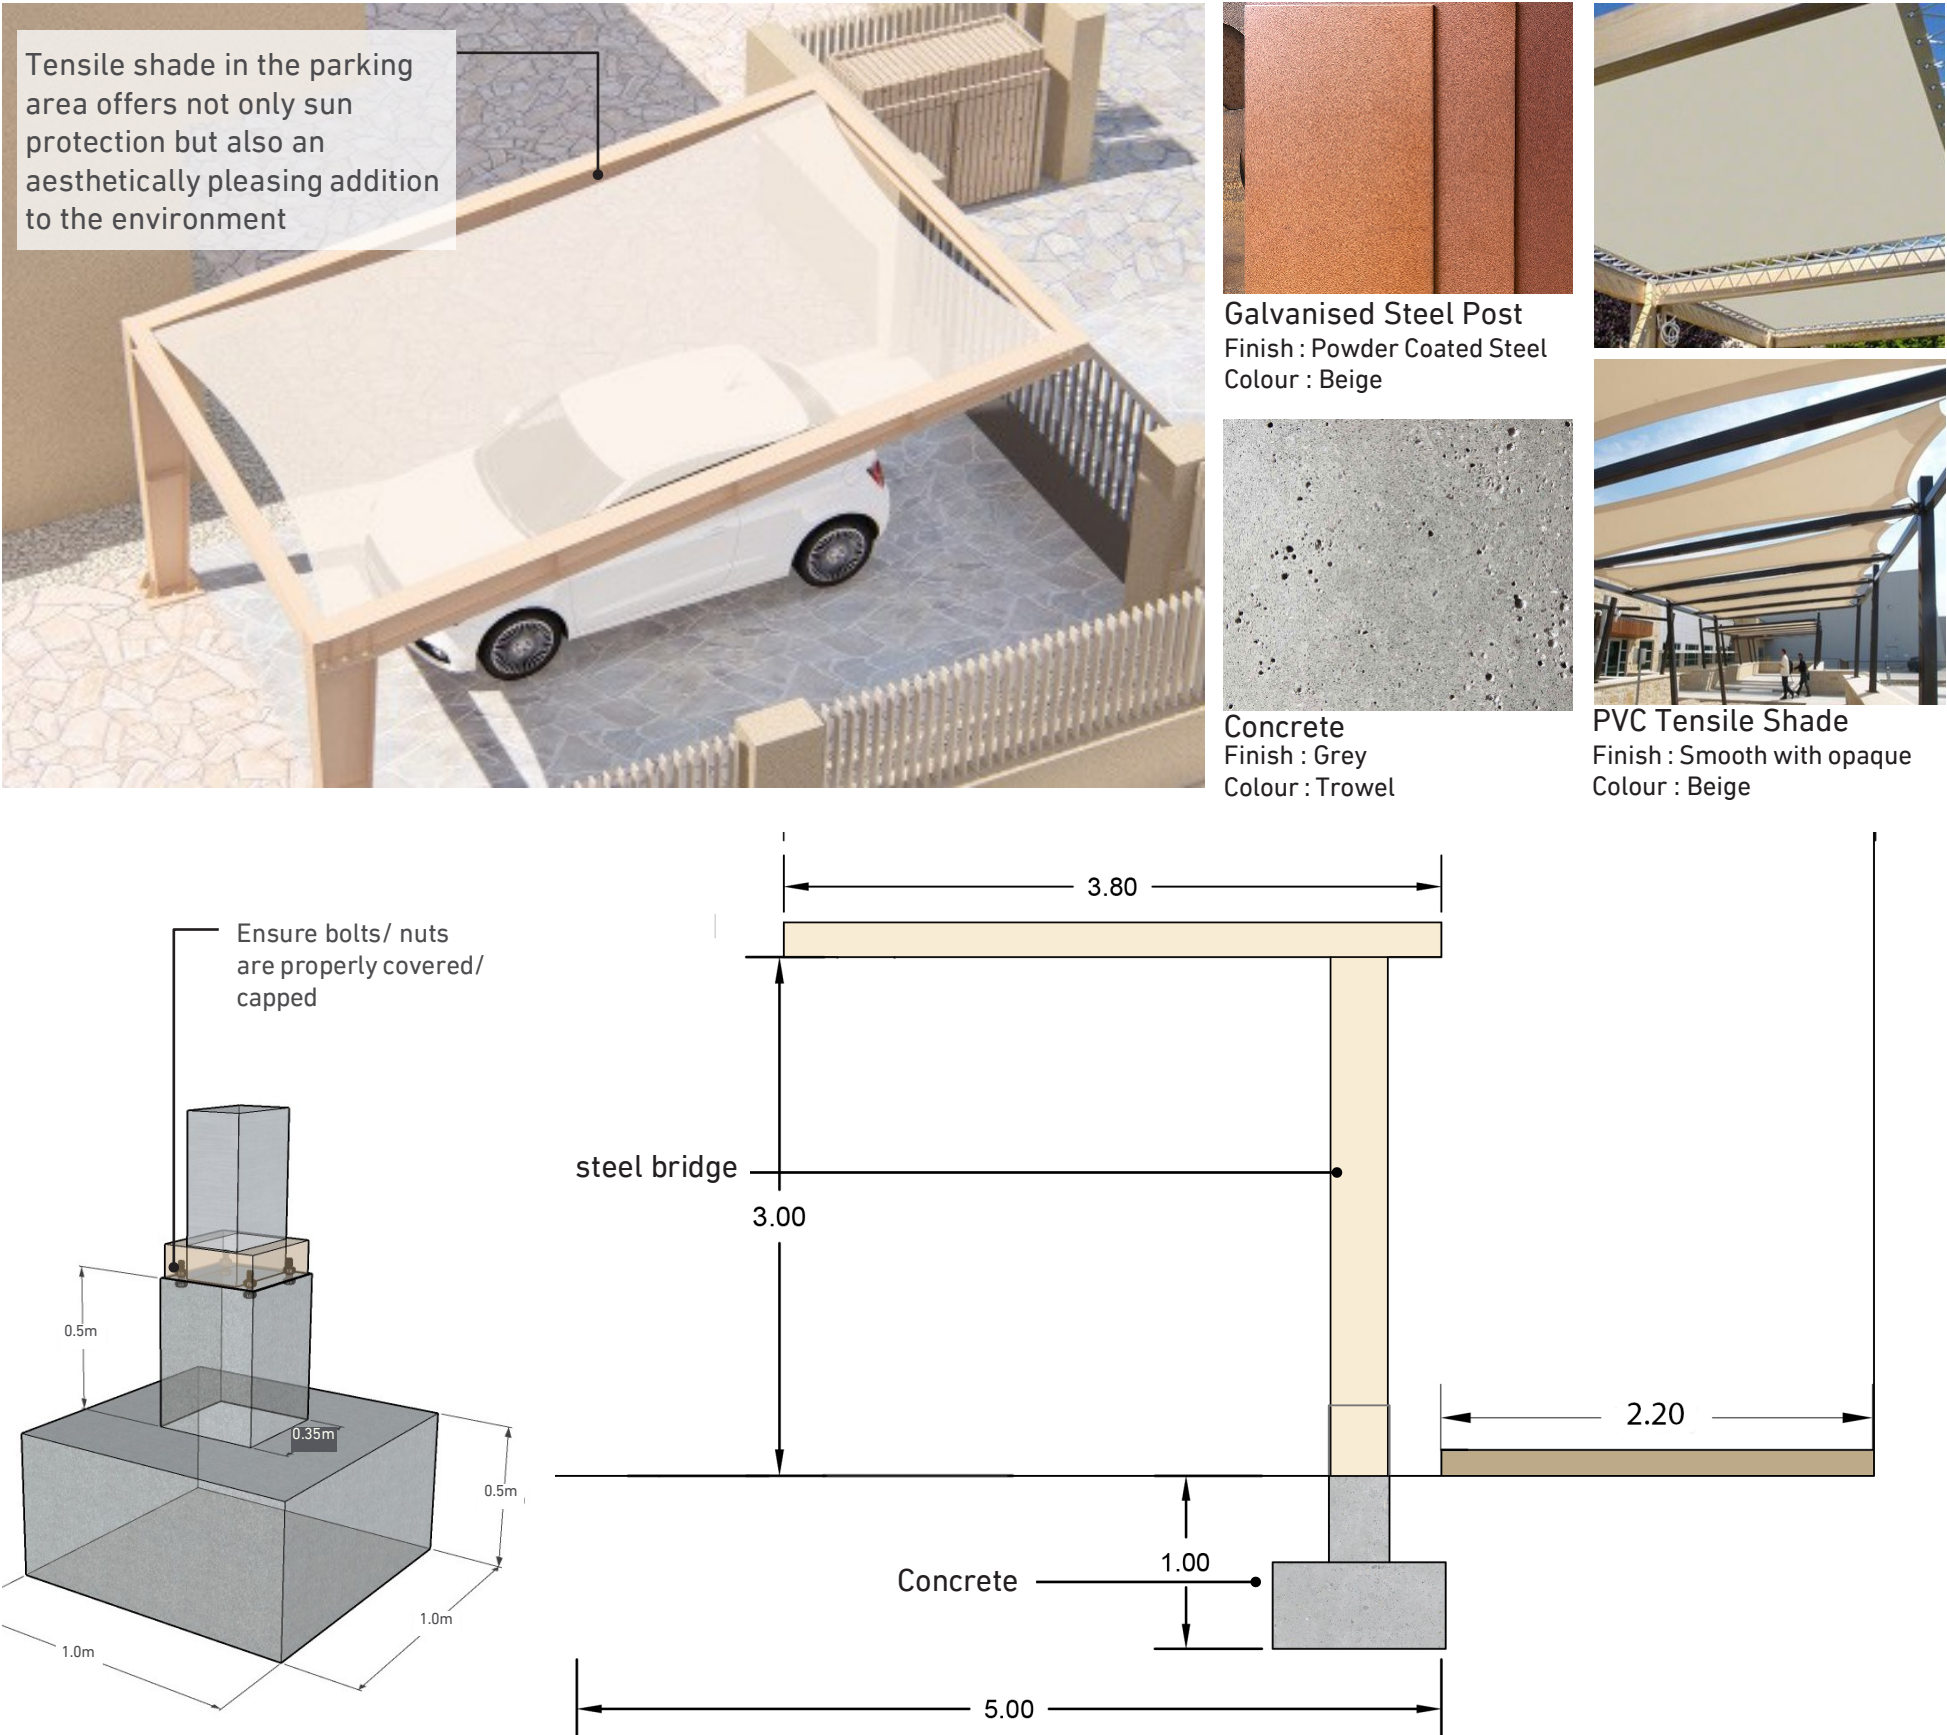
PVC Tensile Shade structure for Private Residence with Boundary Wall Section
